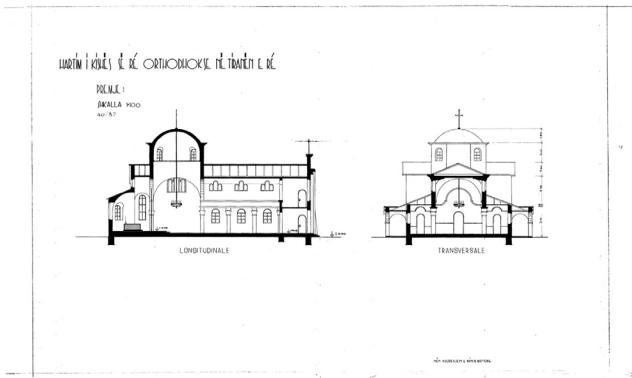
Skënder Kristo Luarasi, Saint Procopius Church, circa 1945, Cross and Longitudinal Section (Technical Central Archive of Construction
